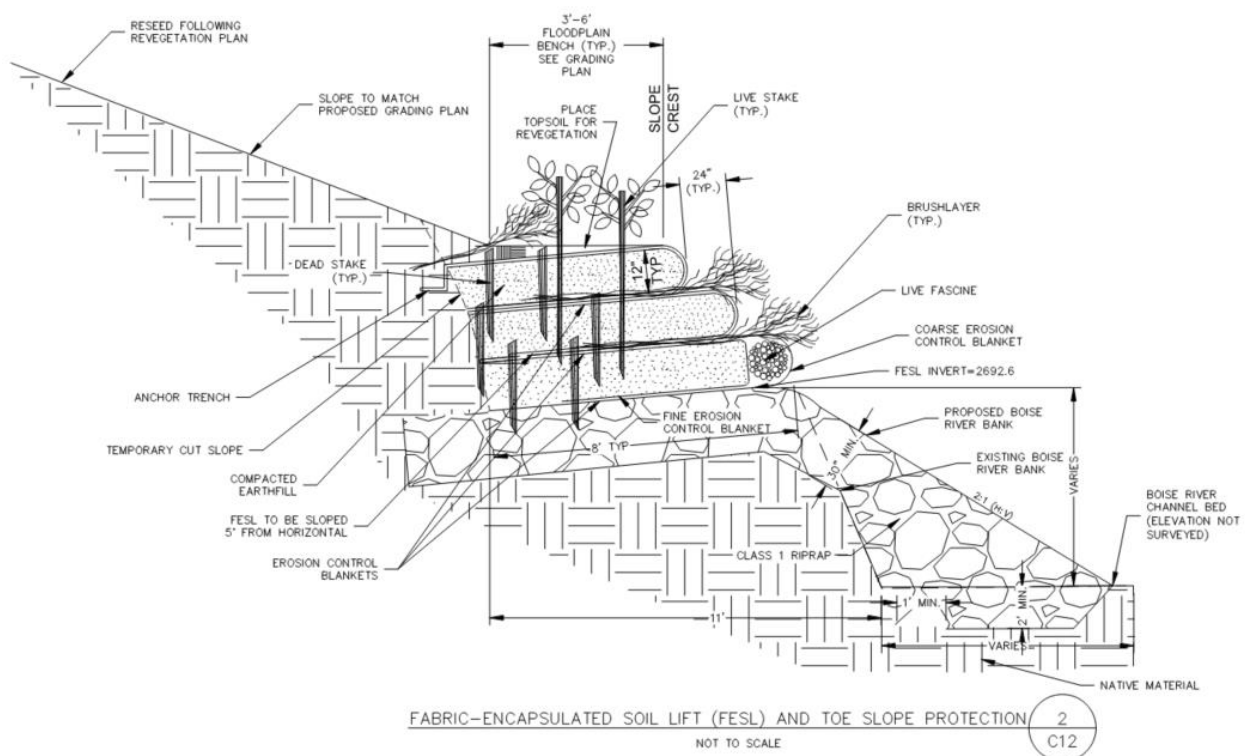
Proposed FESL Design Detail for Cottonwood Creek
